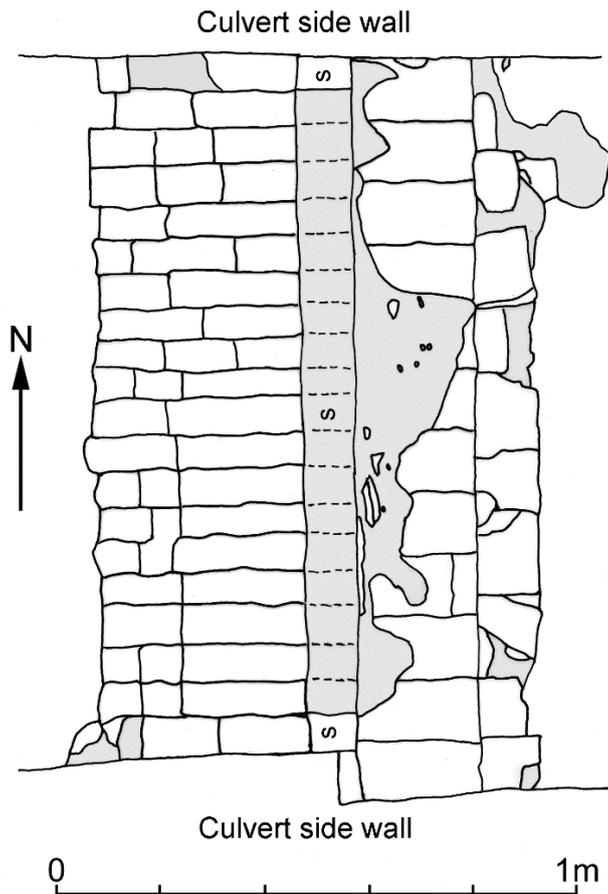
Plan of the slot in the floor of the culvert at the upstream end of section 1. S = Slot.
